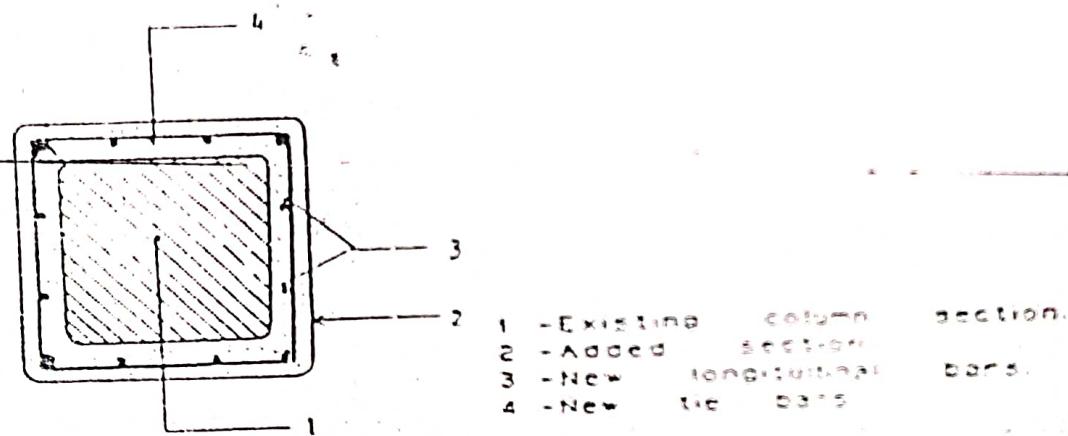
Jacketing a concrete column (after Bibl. 152)
